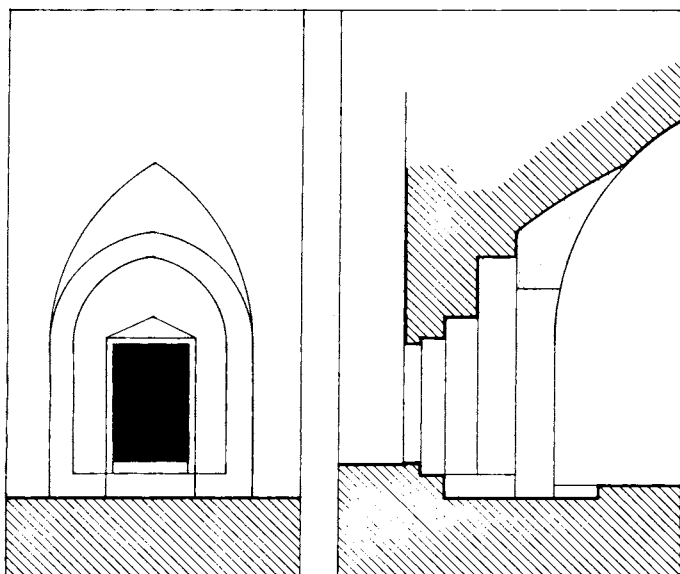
The Citadel of Jerusalem, the Mosque—northern doorway: elevation from inside and section (scale 1:50).
